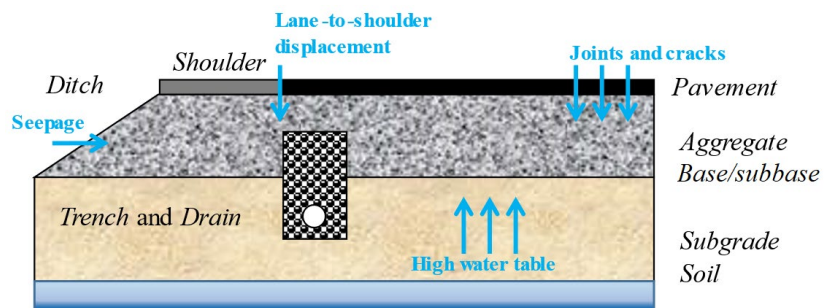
Schematic of pavement and drainage system components (not in scale). The arrows show the main flow pathways for water entering the pavement system.
